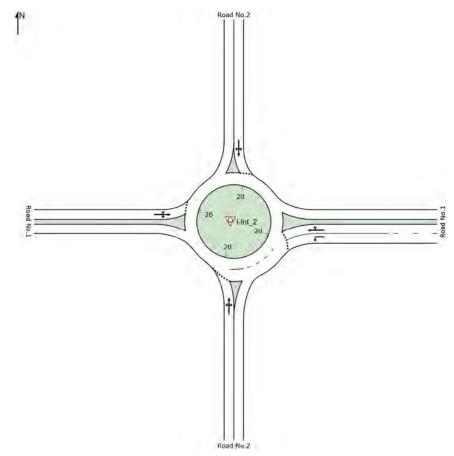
Road No 1 and Road No 2 Proposed Intersection Layout
